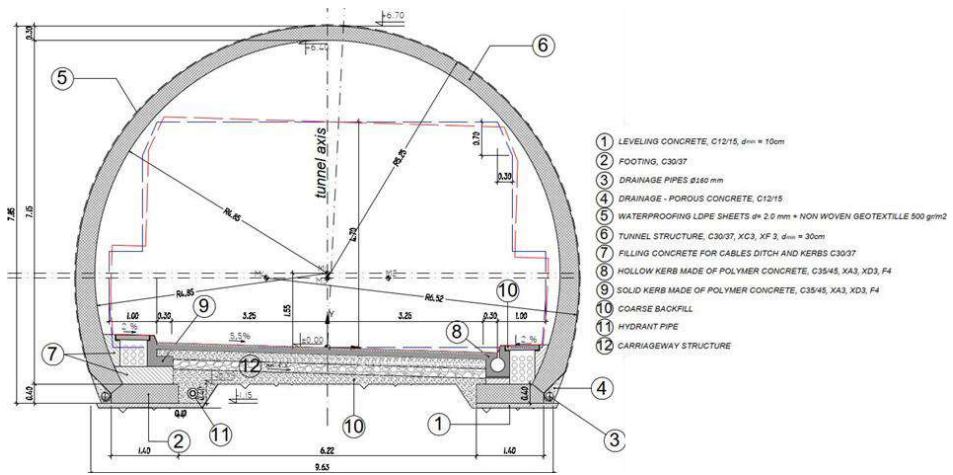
Typical cross-section of the final (secondary) lining for a two-layer tunnel lining (Source: Spasojevic, 2022, 2025)
